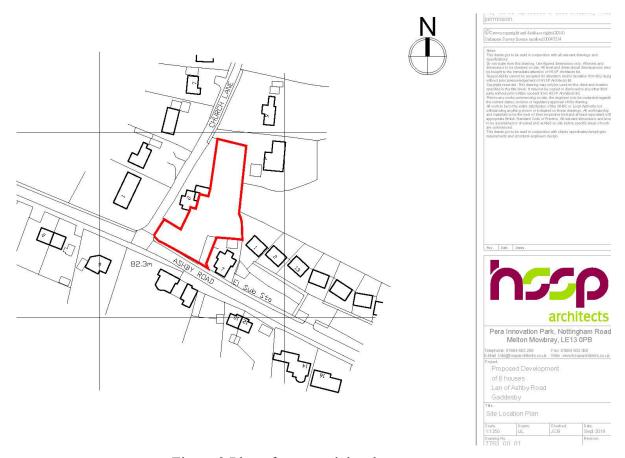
Plan of proposed development area Site highlighted. Plan provided by developer
